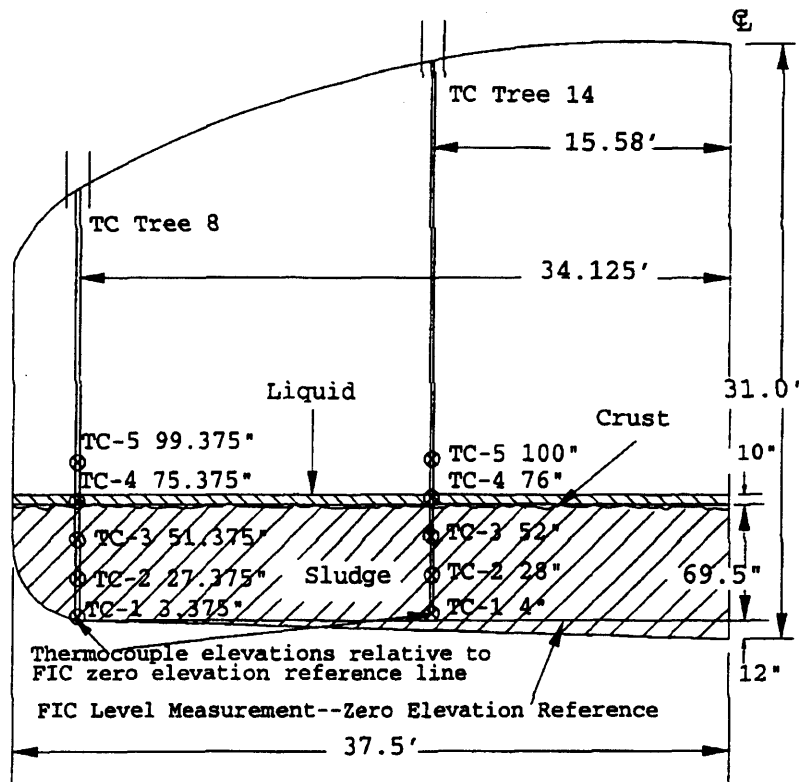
Tank 241-C-106 side view showing tank dimensions [6].
